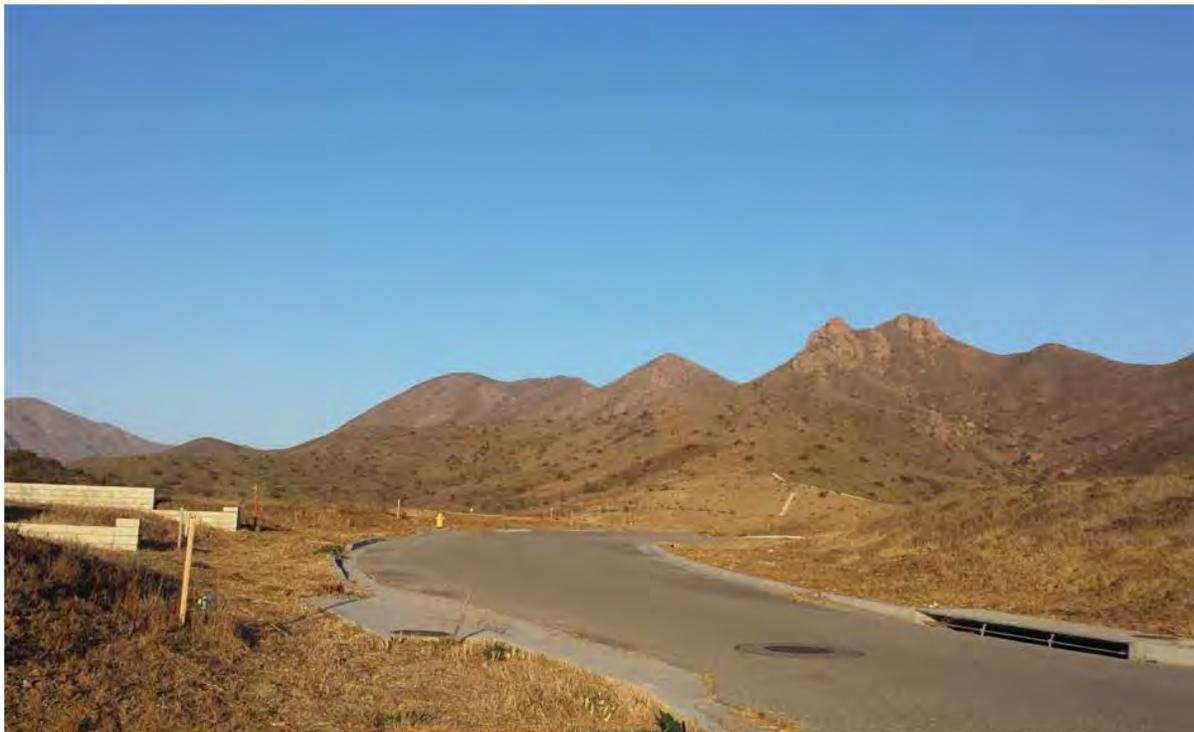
Facing northeast near the Channel Islands Drive and Santa Rosa Islands Drive intersection.
